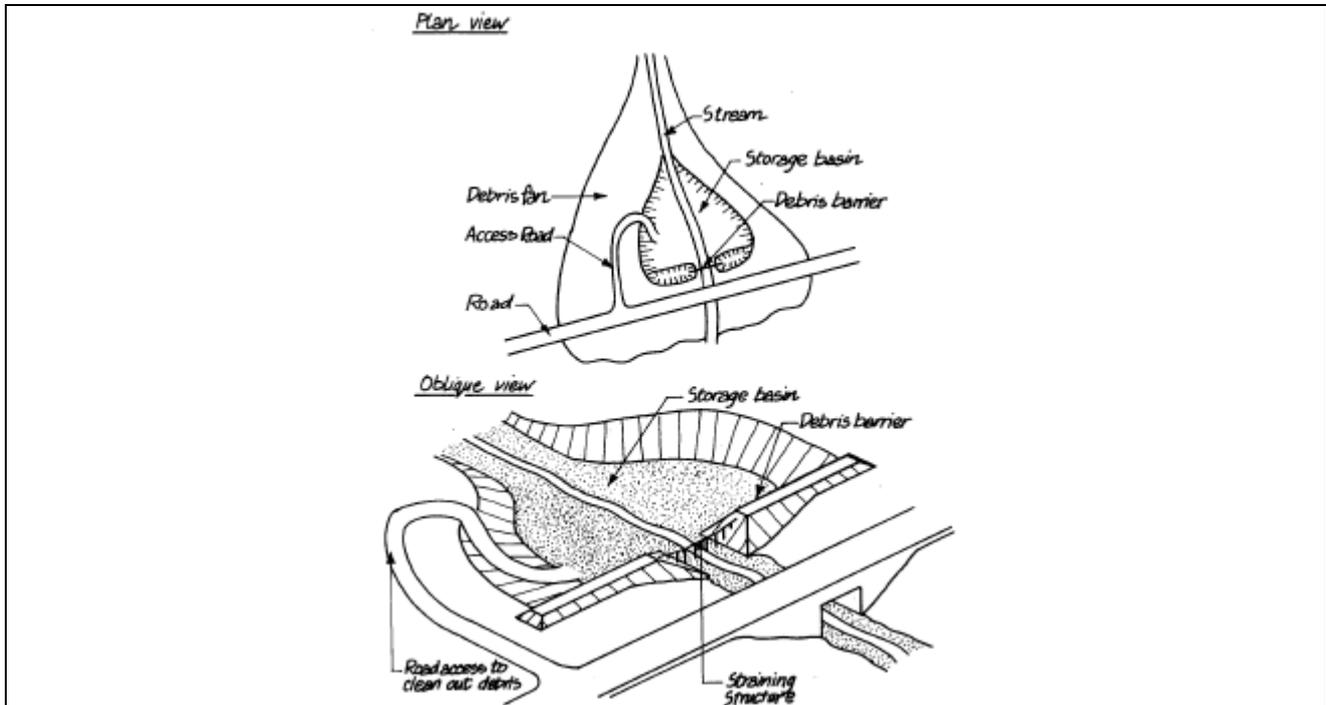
Plan and oblique view of typical components of a debris barrier and storage basin.
